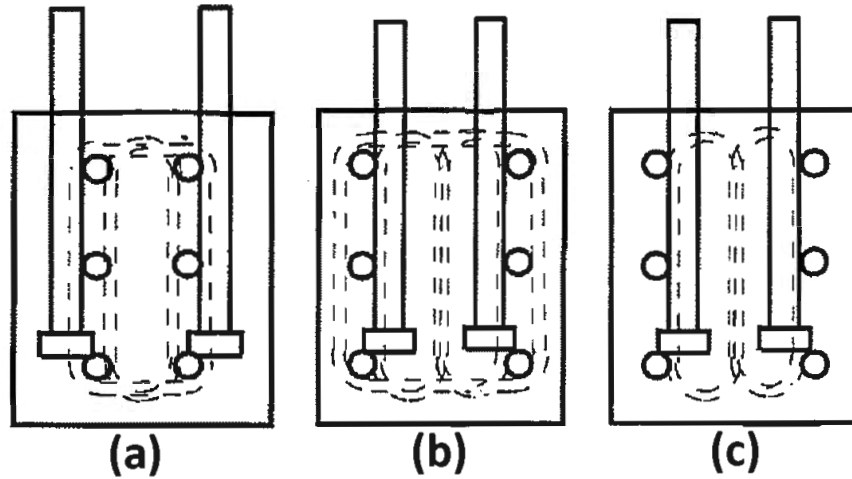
Schematic of the reinforcement layouts used by Bashandy (1996): (a) Headed bars outside the column core and parallel ties (specimens T10, T12, and T13); (b) Headed bars inside the column core and parallel ties (specimens T14 and T25); and (c) Headed bars inside column core but ties were not wrapped around column longitudinal bars (rest of the specimens)
